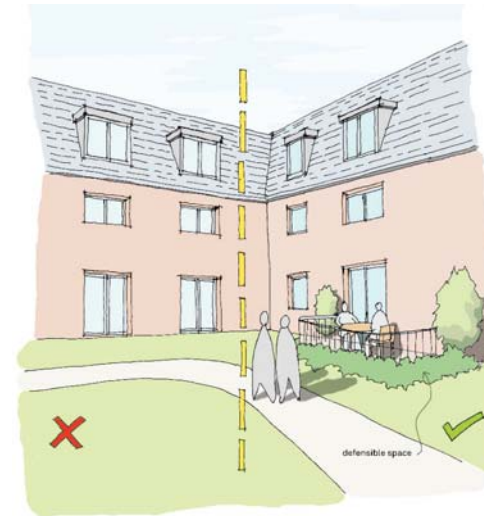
Defensible space should be provided when ground floor flats are adjacent to communal areas
